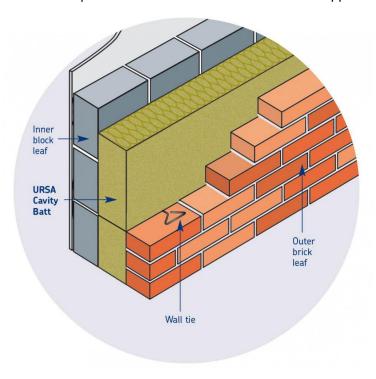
Section of a veneer masonry wall system (Ursa, 2020)
